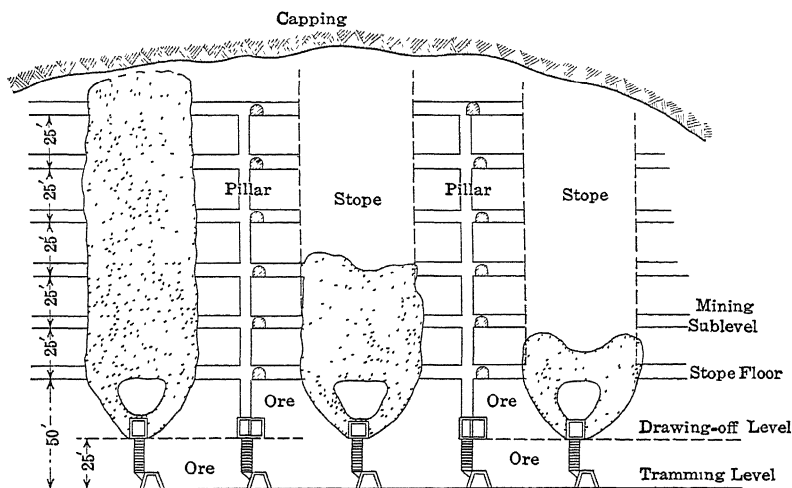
GENERAL CROSS-SECTION THROUGH STOPES AND PILLARS.
